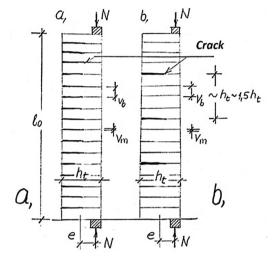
a) The continuously cracked masonry column (assumed) *b)* The discretely cracked masonry column (according to experiments)
